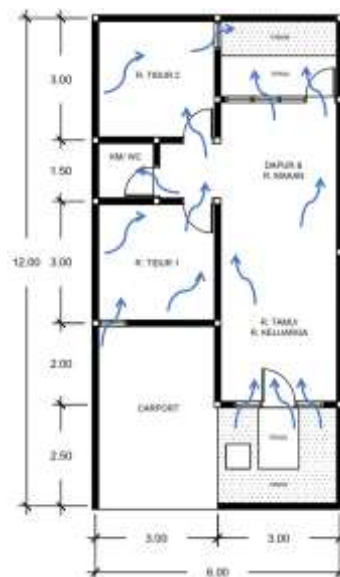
Schematic design concept of the 51 m² residential building existing plans
